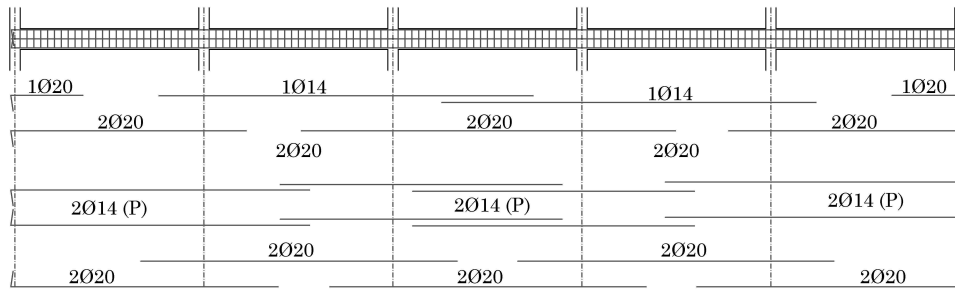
Reinforcement bars of beams at the 9th storey of frame SR91
